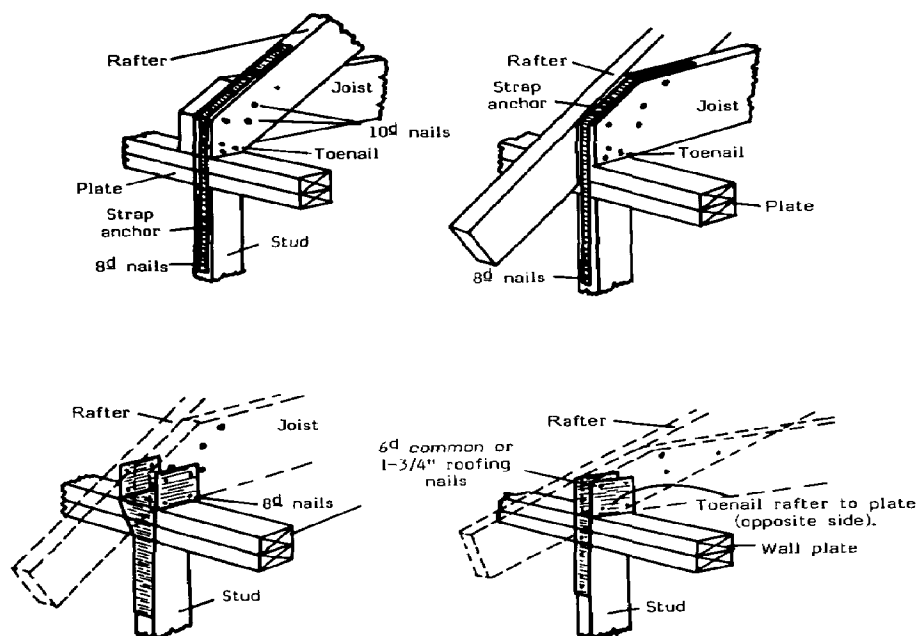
Roof-to-wall connectors. The top drawings show metal strap connectors: left, rafter to stud; right, joist to stud. The bottom left drawing shows a double-member metal-plate connector—in this case with the joist to the right of the rafter. The bottom right drawing shows a single-member metal-plate connector. Source: *Houses Can Resist Hurricanes*, U.S. Forest Service Research Paper FPL 33.
